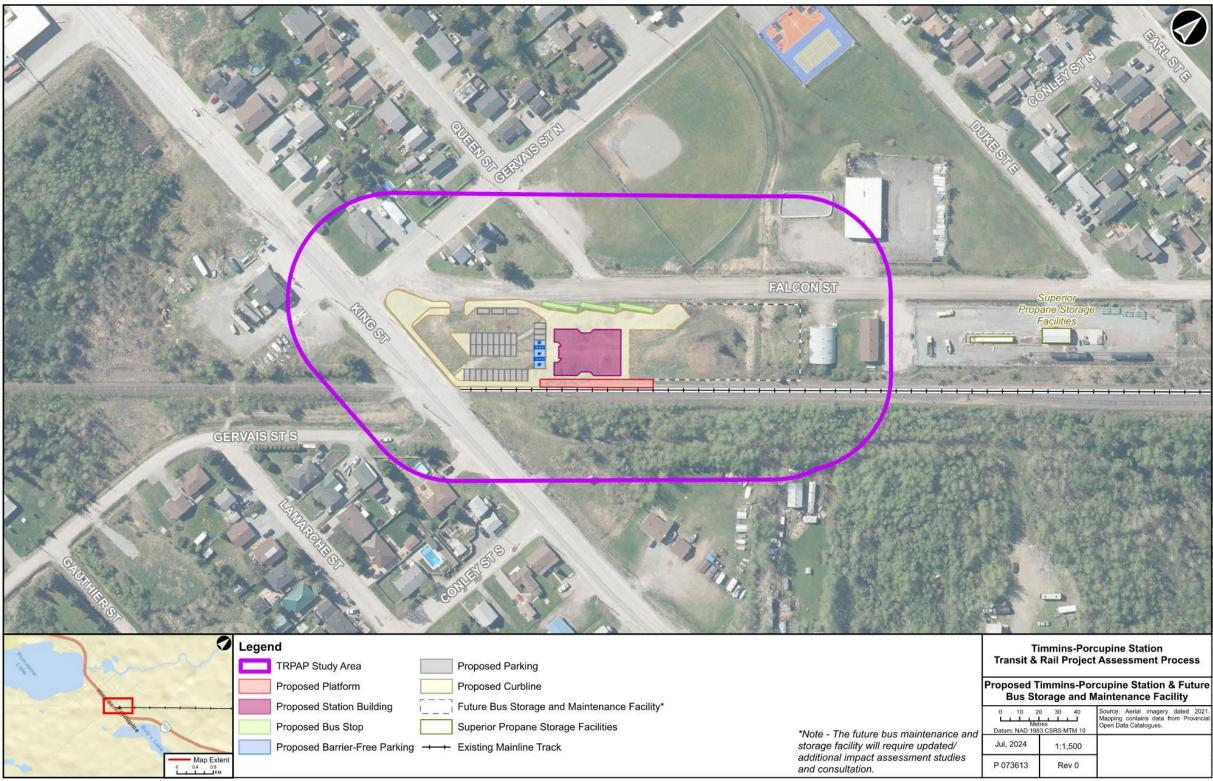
Timmins-Porcupine Station Study Area and Conceptual Site Layout
